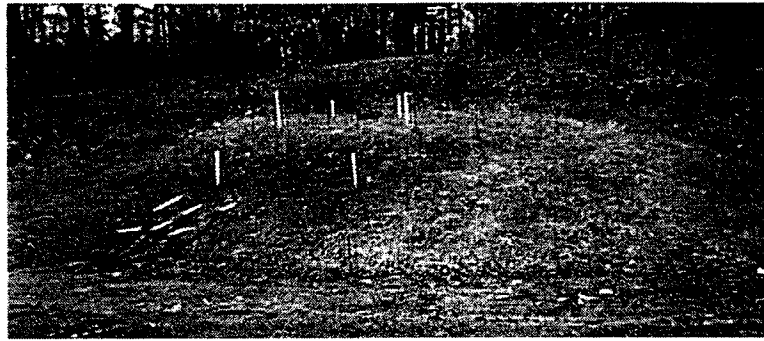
Test embankment layout. The left side was stabilized with six wick horizontal wick drains (exiting the slope encased in the white PVC pipes attached to black hoses). The right side was not stabilized. Vertical white pipes are shallow piezometers.
